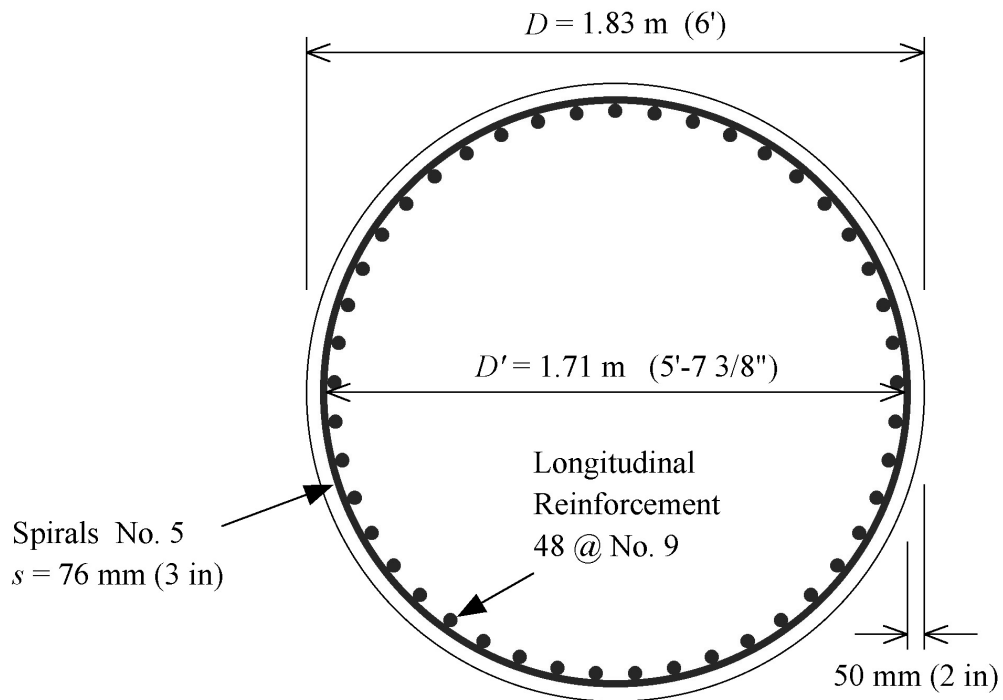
Cross section of reinforced concrete bridge column analyzed
